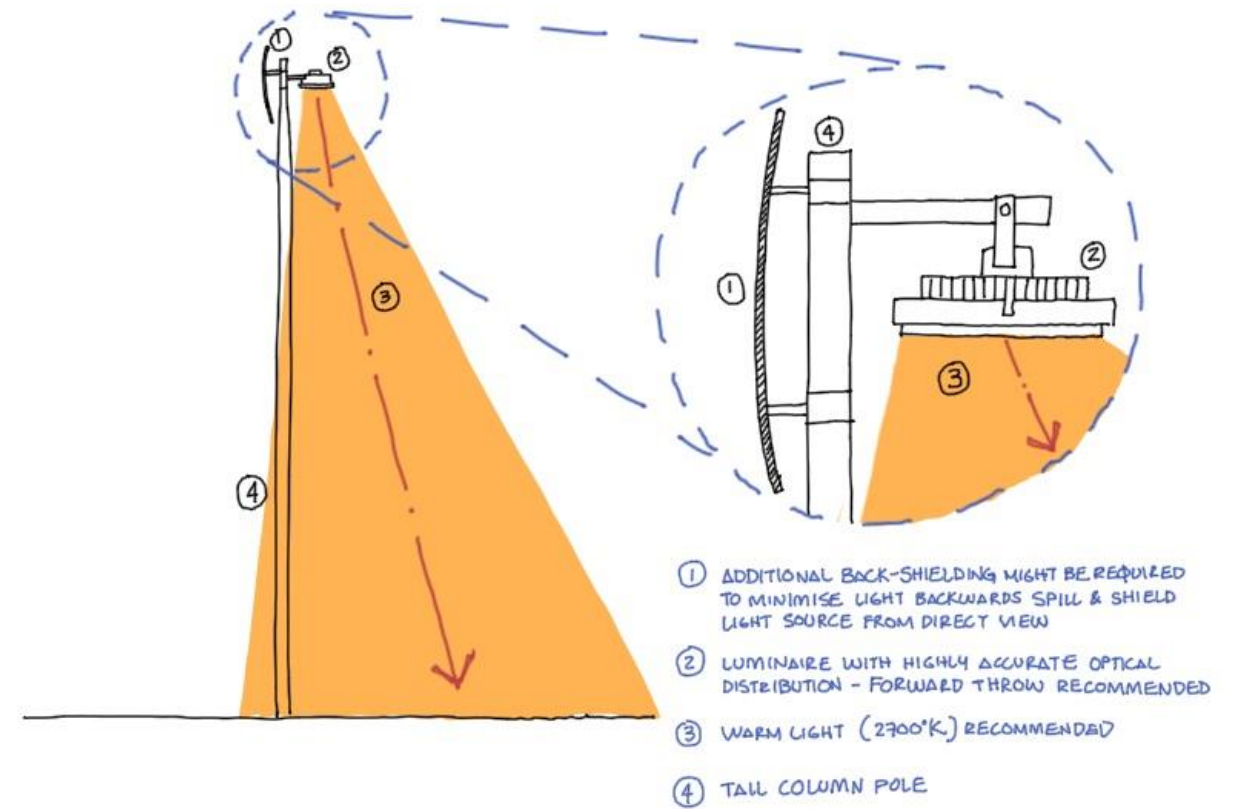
Sketch with potential back shielding for 18m columns located in railhead
